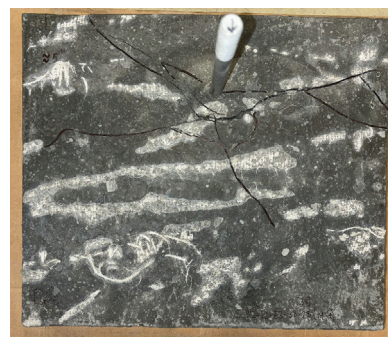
Carriage bolt failure modes and cracking pattern.
